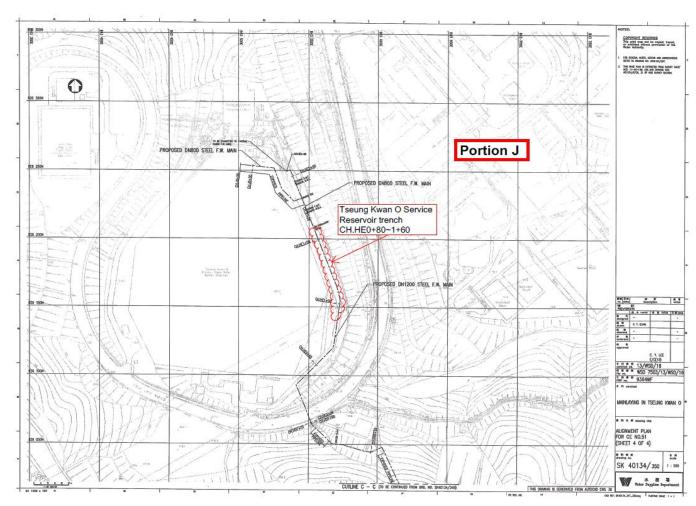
Location Plan for Portion J – CE.HE0+80~1+60
